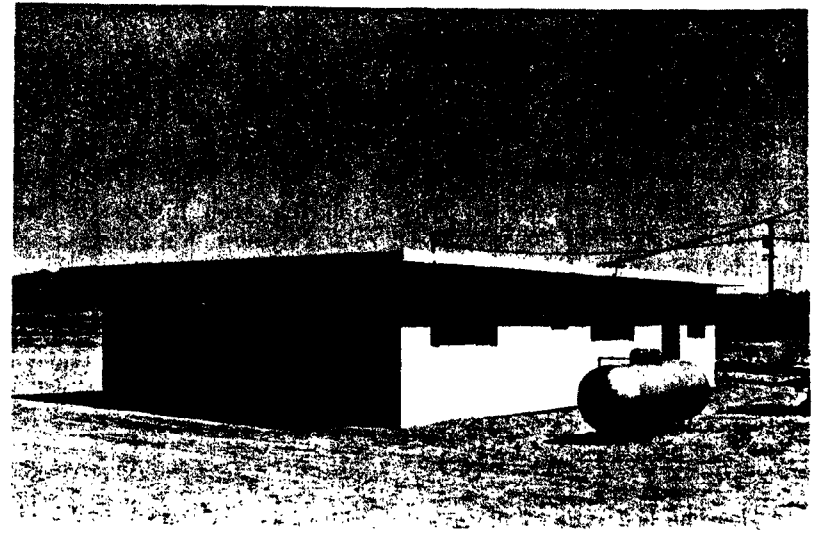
Reinforced precast concrete house before a nuclear explosion, Nevada Test Site.
